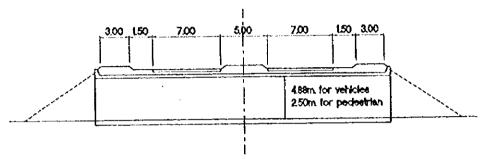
AN EXAMPLE OF UNDERPASS
